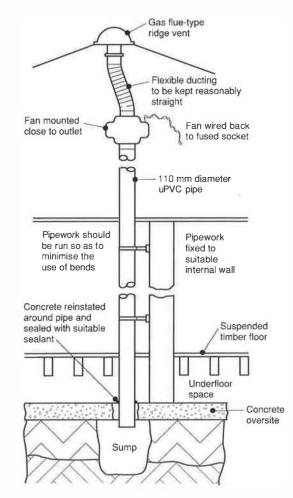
A mini sump beneath a concrete oversite with external fan and ductwork
